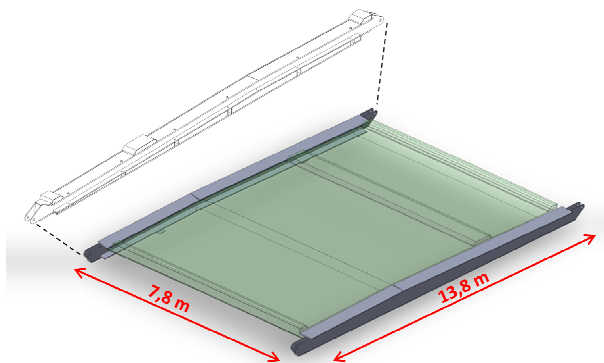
The design of the Pijlebrug consisting of an FRP deck spanning in between two steel lifting beams in crosswise direction.
